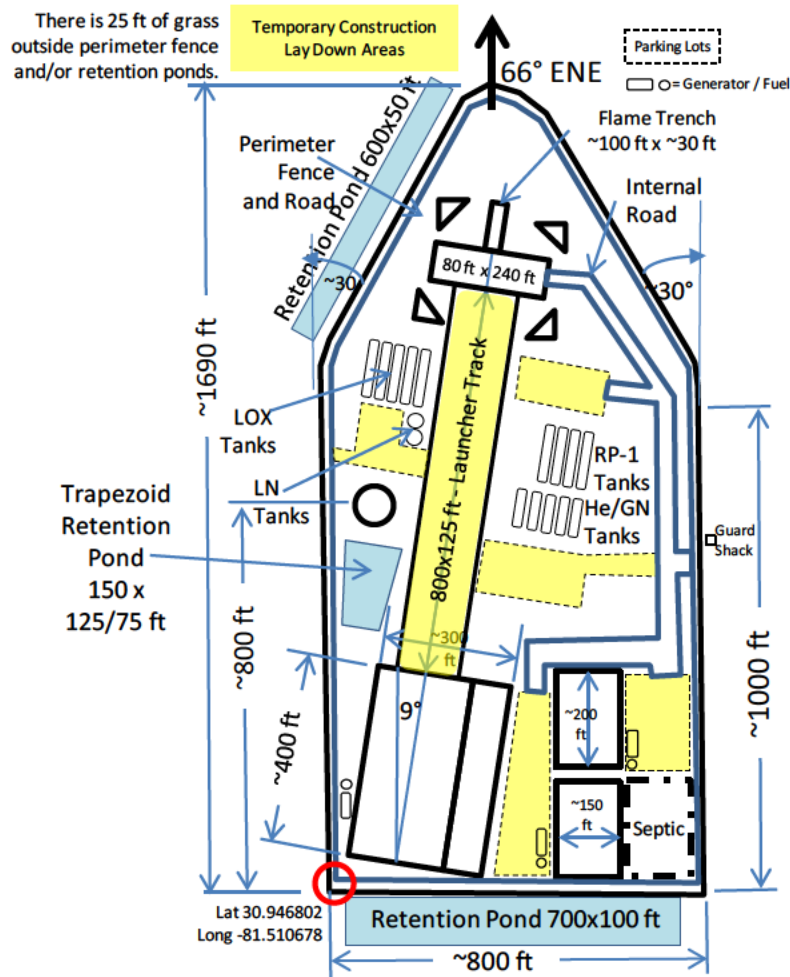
Proposed Launch Pad Complex Site Plan – Overhead Schematic
